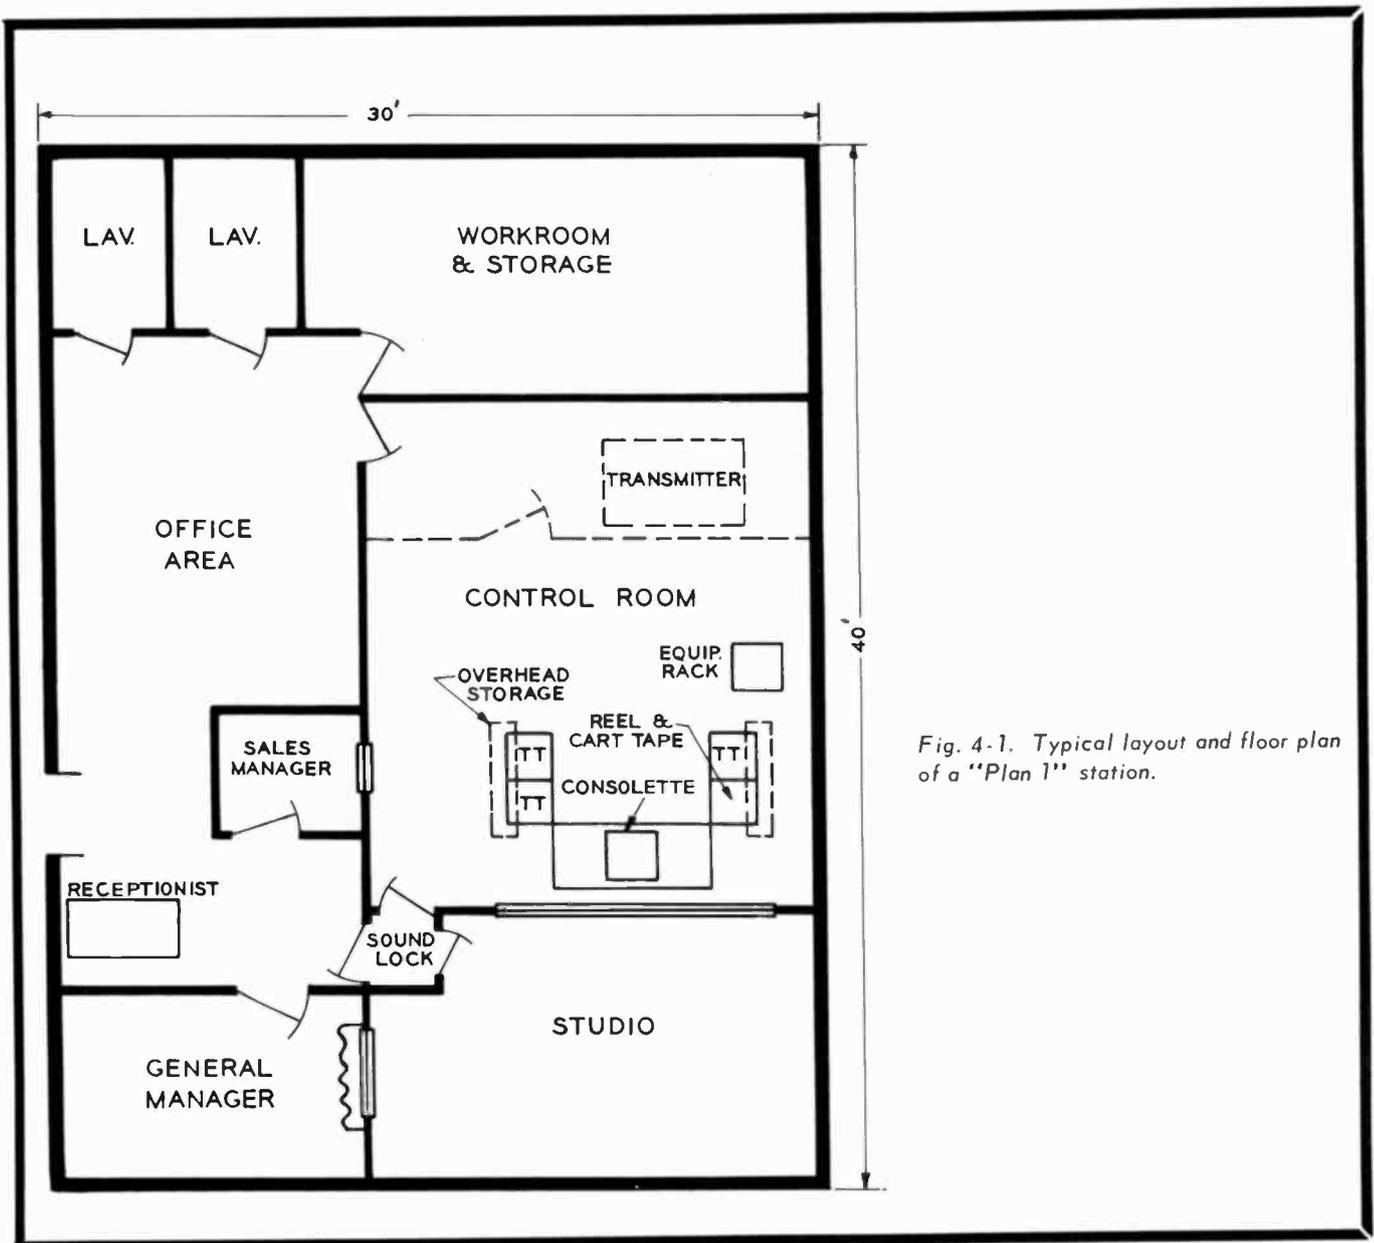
Typical layout and floor plan of a "Plan 1" station.
